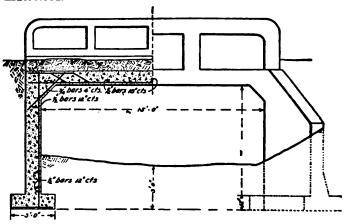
Standard Bridge of 15-Foot Span, Illinois State Highways.
